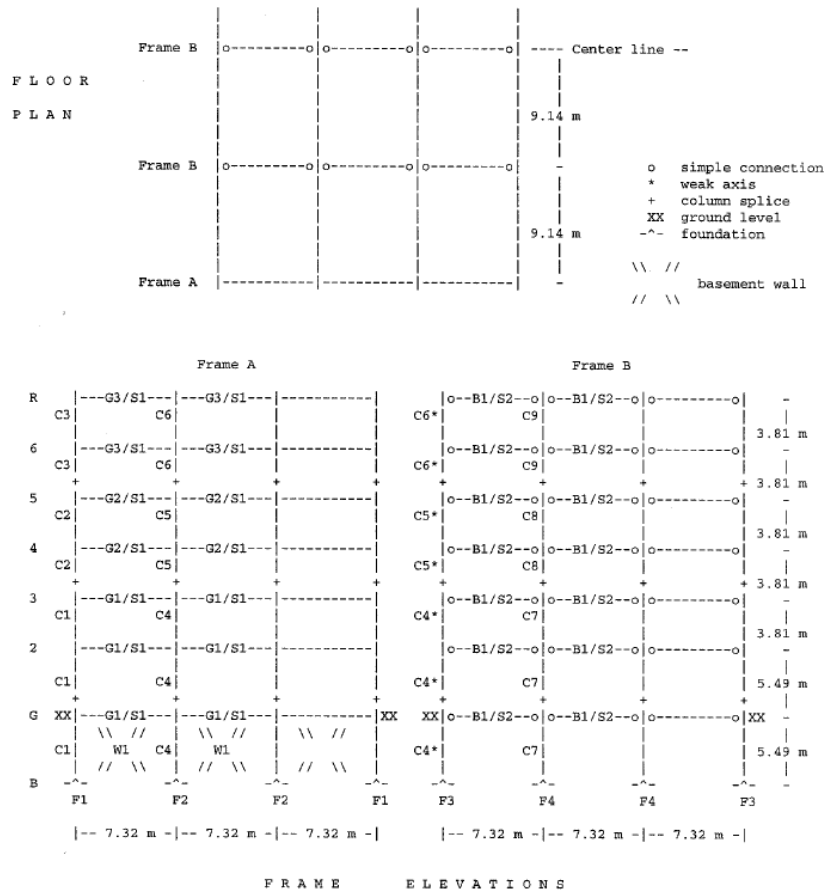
Floor plan and frame elevations of the 6-story building designed according to the UBC94 (U6) Reproduce from Hall (Hall, 1997).
